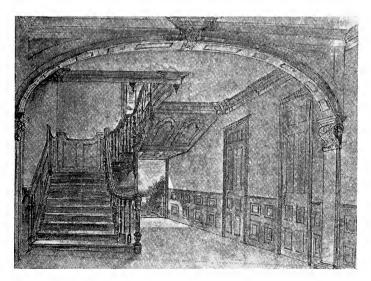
Doorway: CAT. 1020. A detail for No. 109. Collection, New York State Museum
